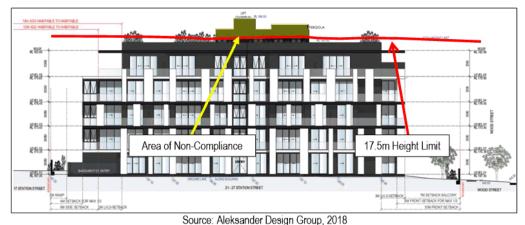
South Elevation Showing Extent of Height Non-Compliance
